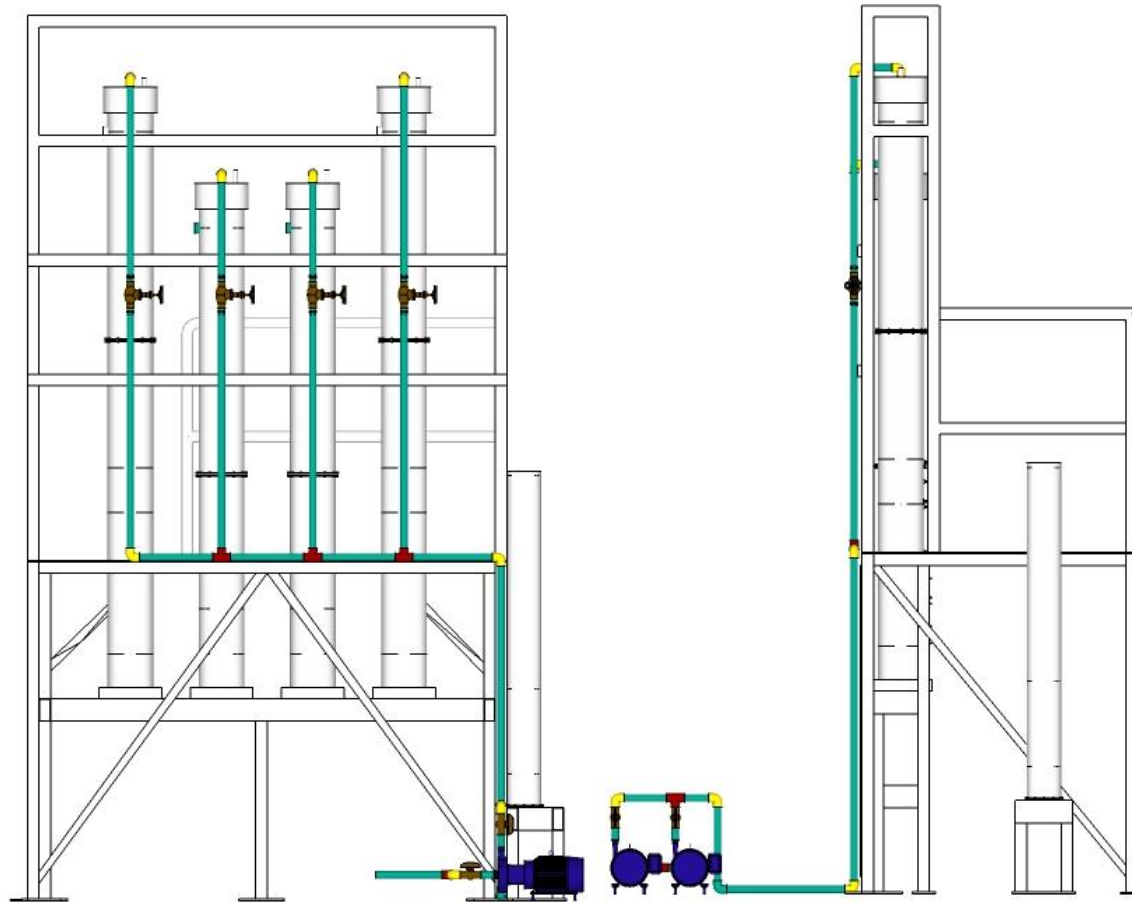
Projection view of piping run from inlet pump to top of biofilters
